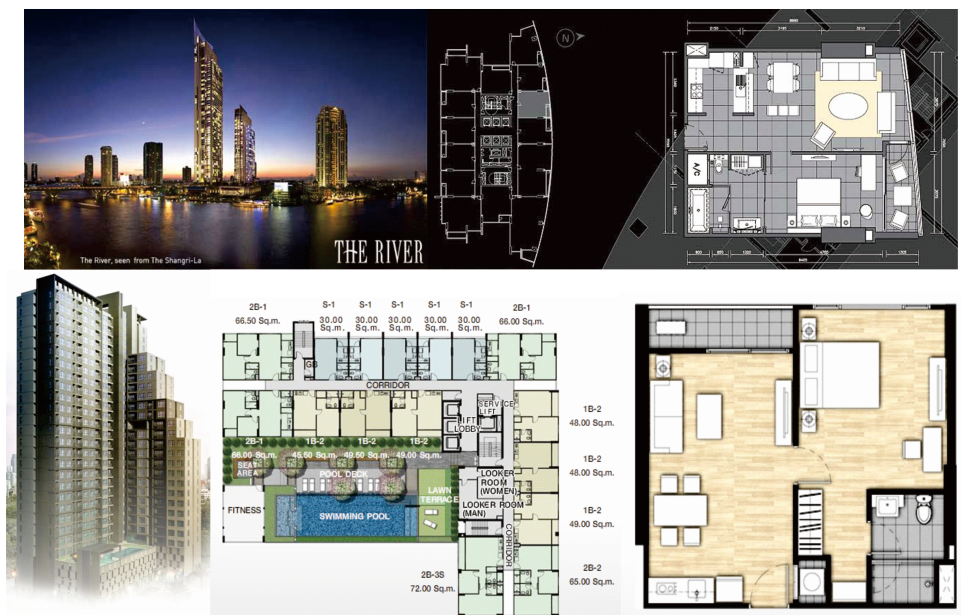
External view, typical floor plan and unit floor plan of existing condominiums in Bangkok urban area; (above) The River (www.theriverbangkok.com), and (below) The Hive Taksin (www.sansiri.com).
